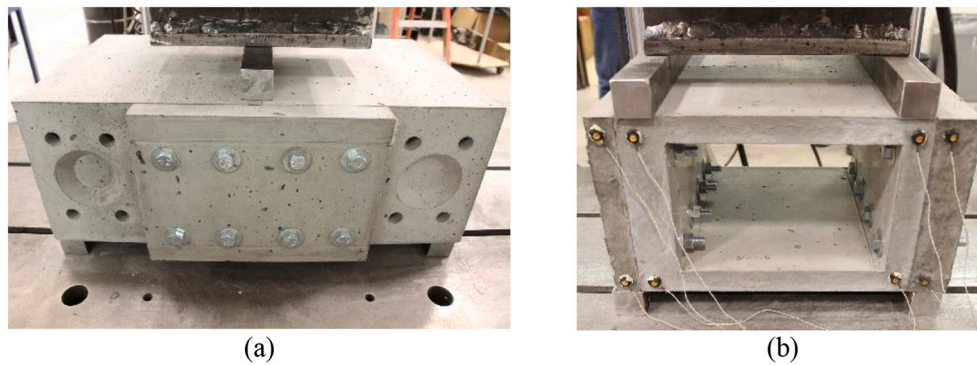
Mechanical test set-up for the two assemblages: (a) Specimen 1; and (b) Specimen 2.
